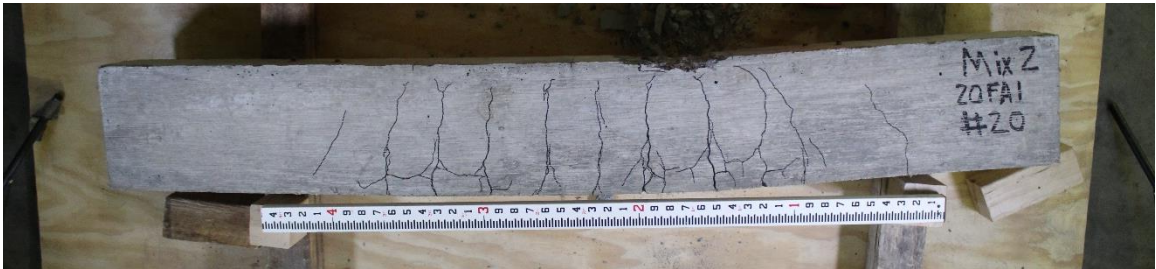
Mixture 2 (20FA1) beam #20: concrete beam side view.
